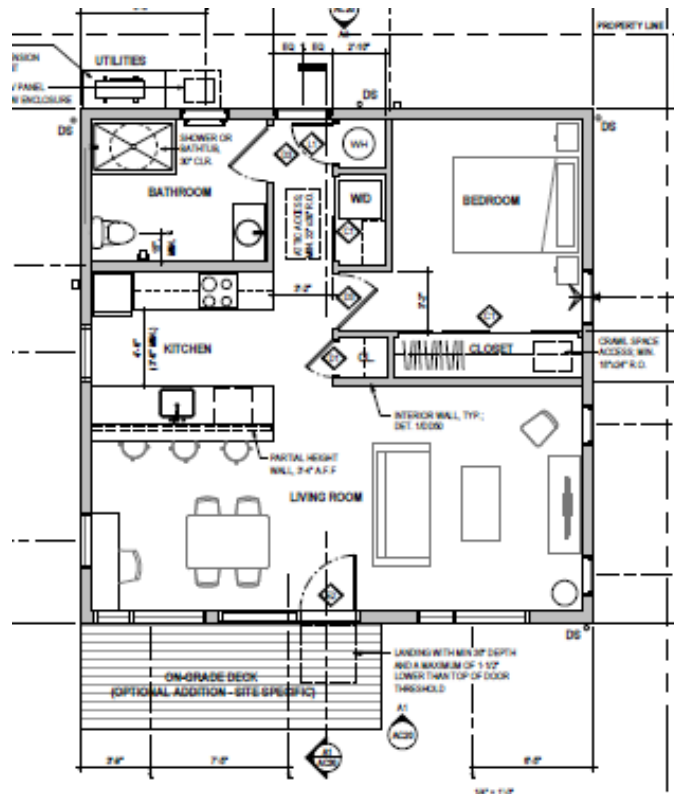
1-bedroom ADU Floor Plan (HEART GLADUR Plans Sheet AC11)
